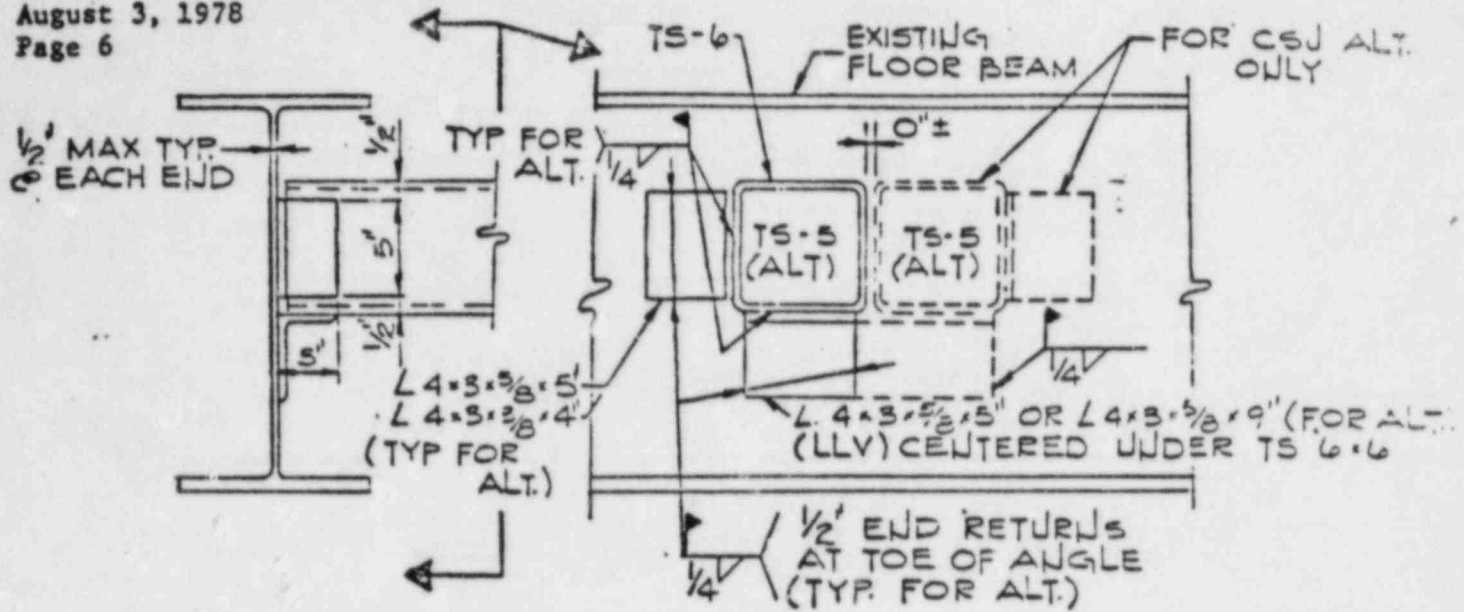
TYPICAL CROSSOVER BEAM CONNECTION
